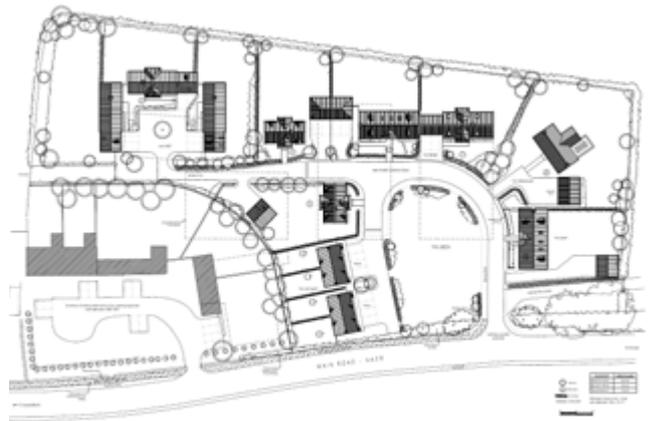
Site plan of Southside Close, showing the layout of the development which draws from traditional farmstead principles. (Fowler Architecture and Planning)
